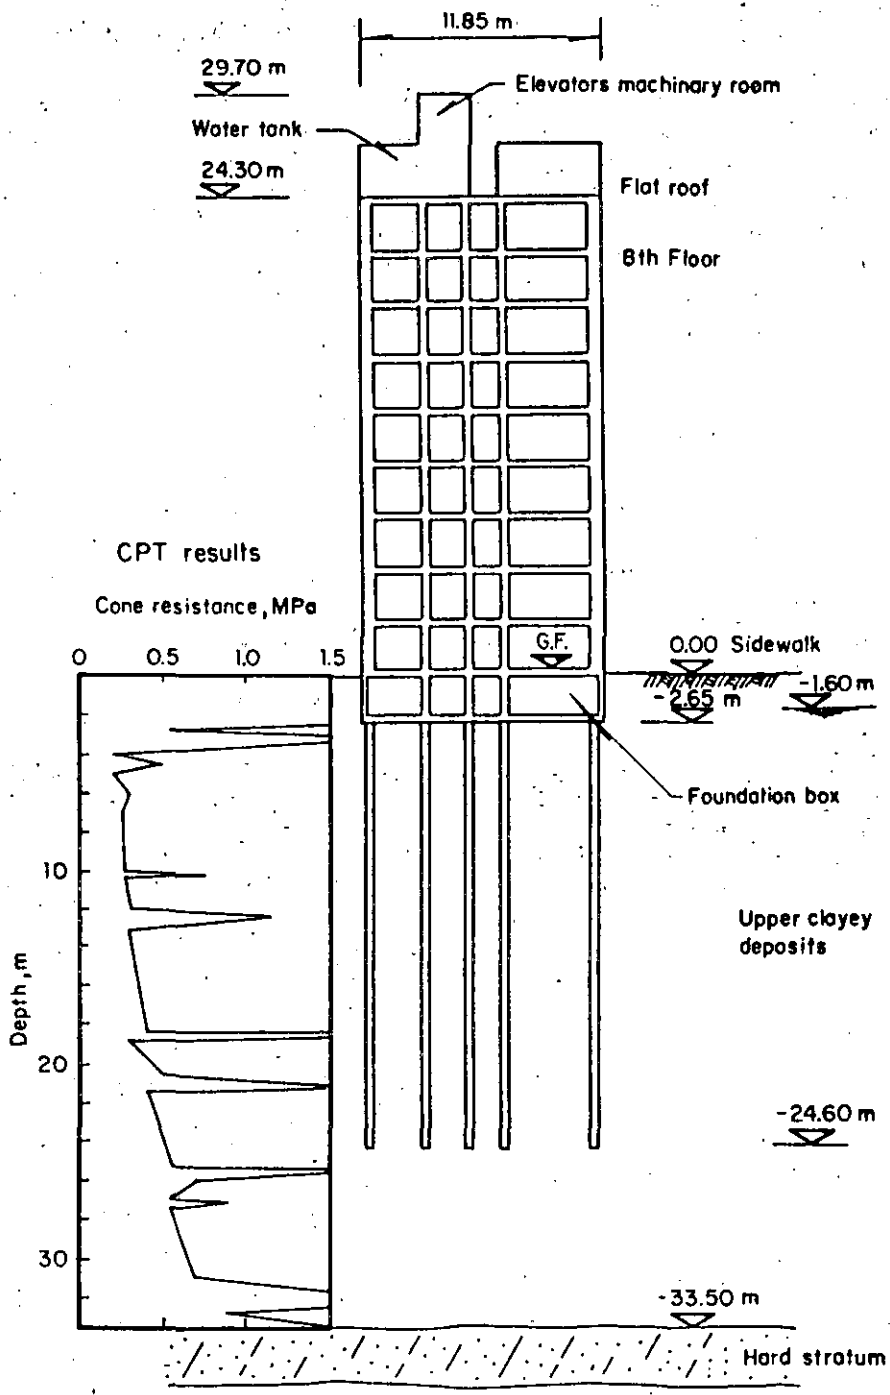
Elevation of the Building V including foundation and geotechnical conditions.
